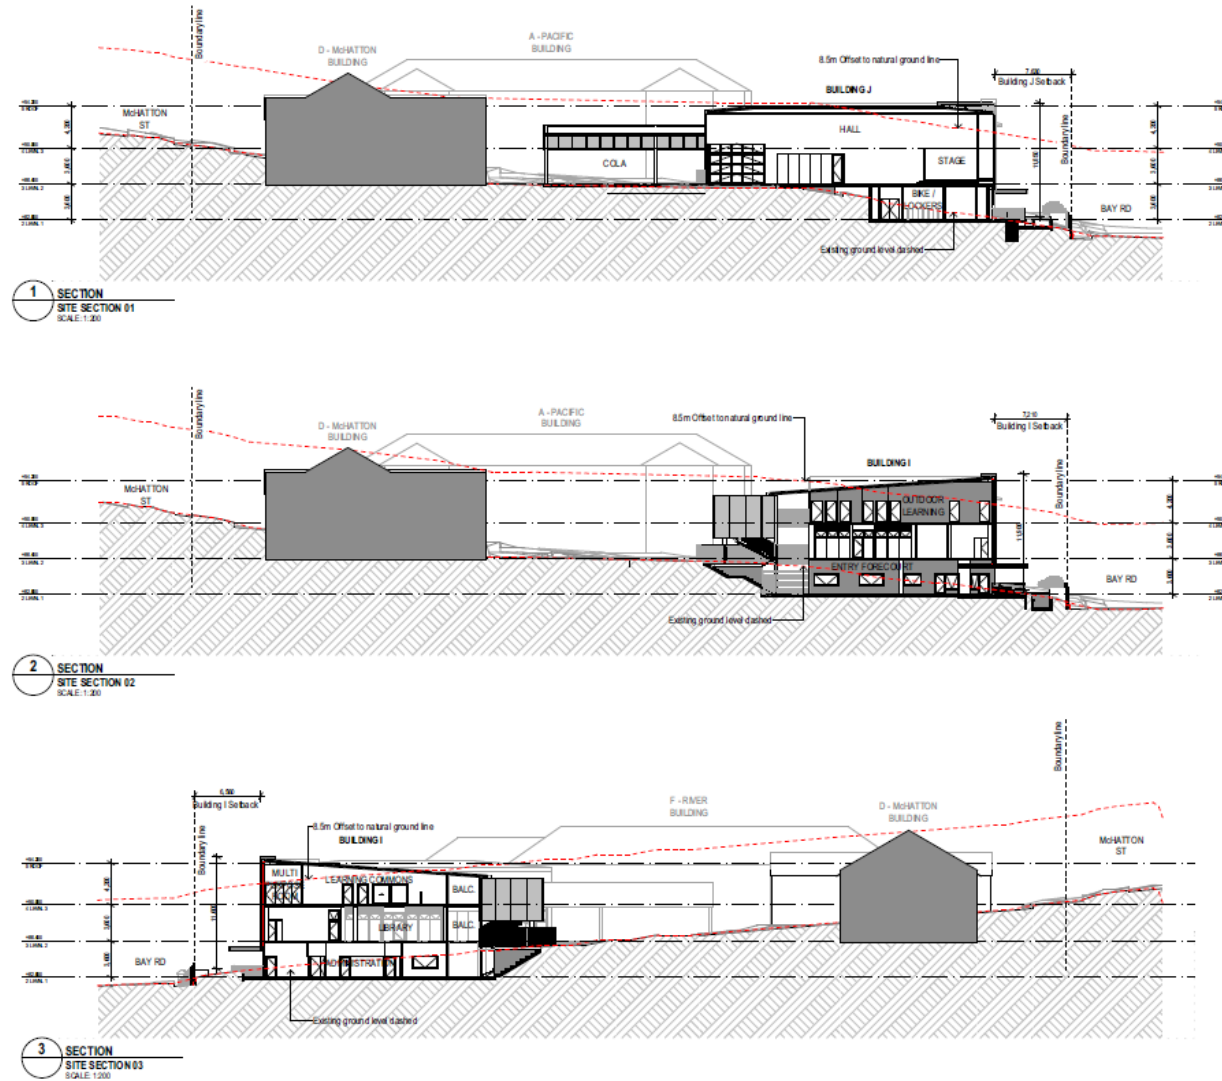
Proposed Site Sections. Source: Fulton Trotter, 2021; Drawing No. SD-1104, Rev C, 13.8.2021.
